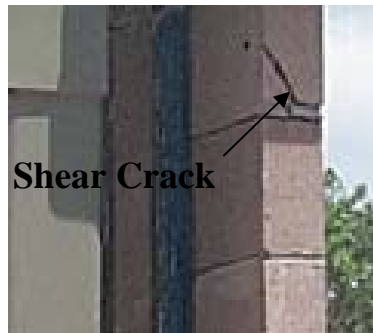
Shear Crack at Top Support of Wall B1 after Event #6
